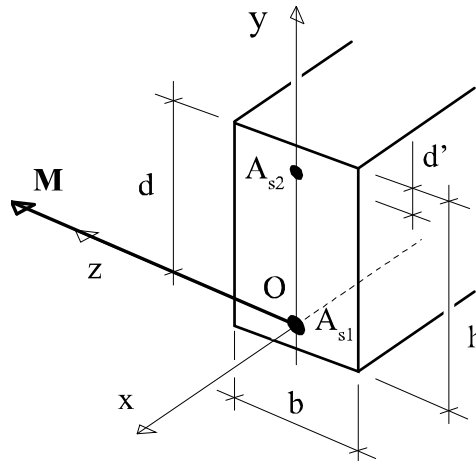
Characteristics of a rectangular reinforced concrete section
